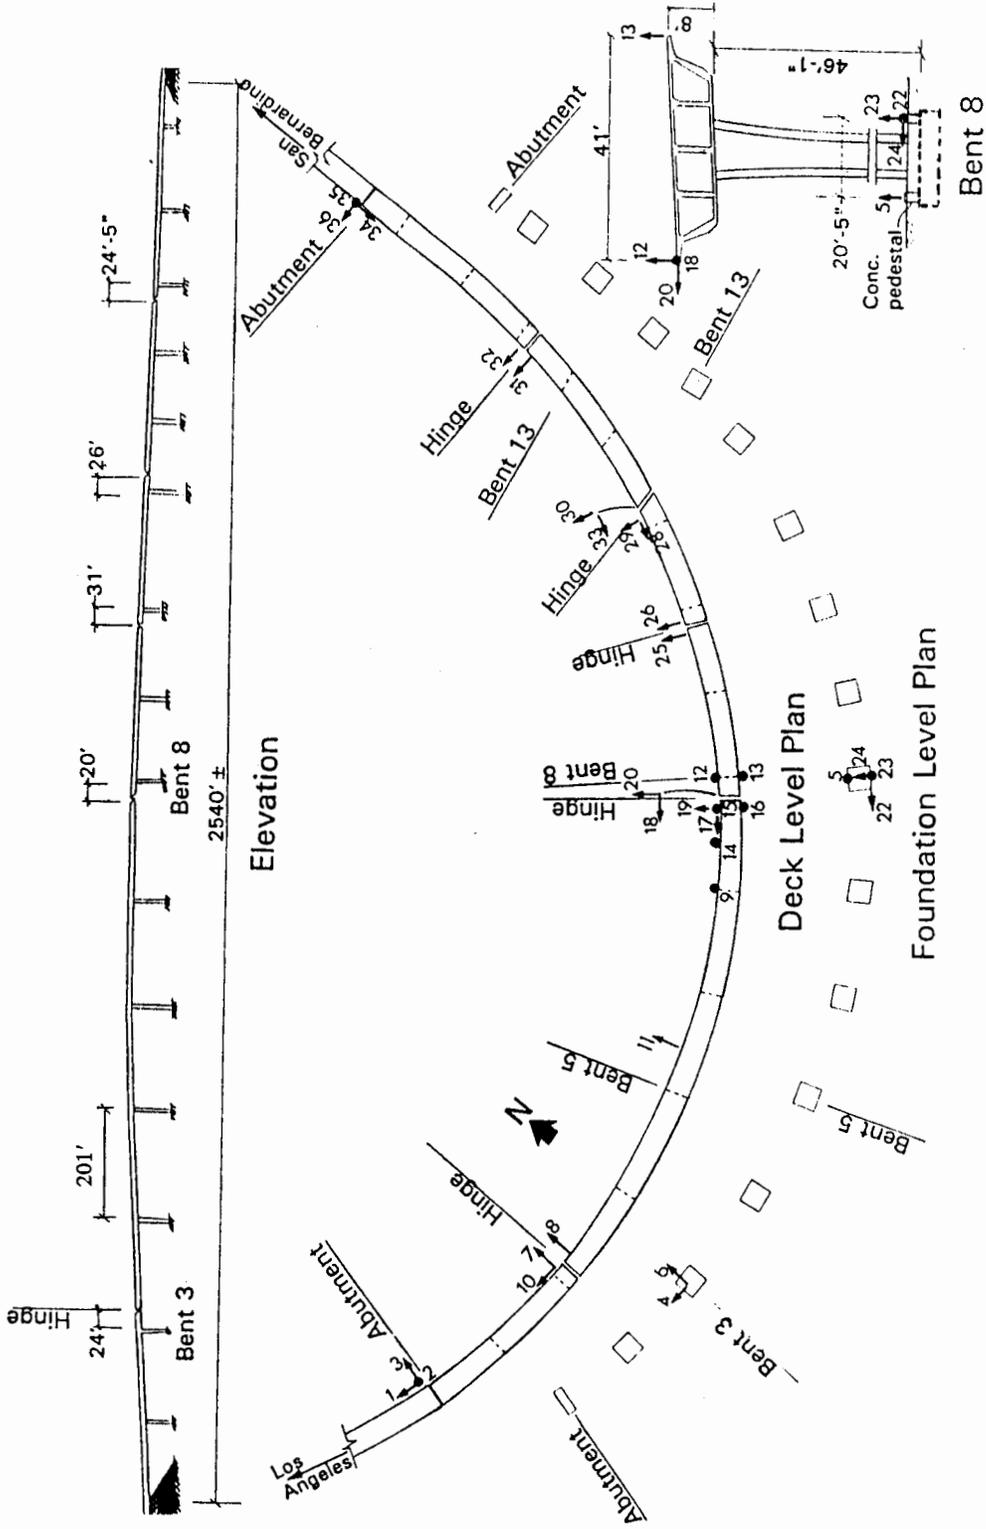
Plan and elevation views of the I10/215 interchange bridge near San Bernardino. Sensor locations and directions are indicated.
